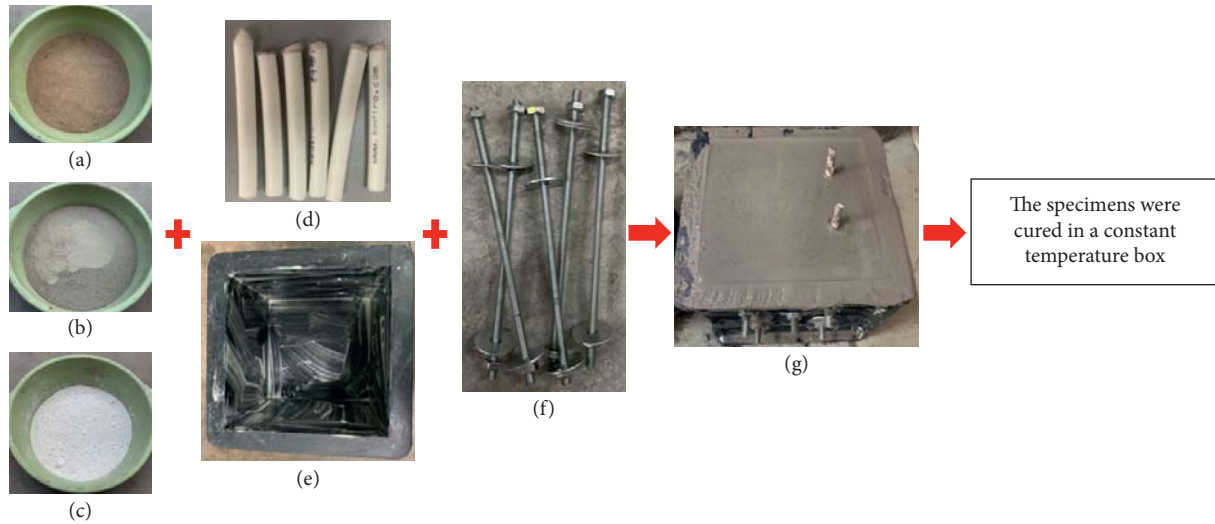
Fabrication process of the specimen. (a) River sand; (b) cement; (c) gypsum powder; (d) acid solution catheter; (e) mold coated with release agent; (f) bolt, gasket, and nut; (g) specimen after fabrication.
